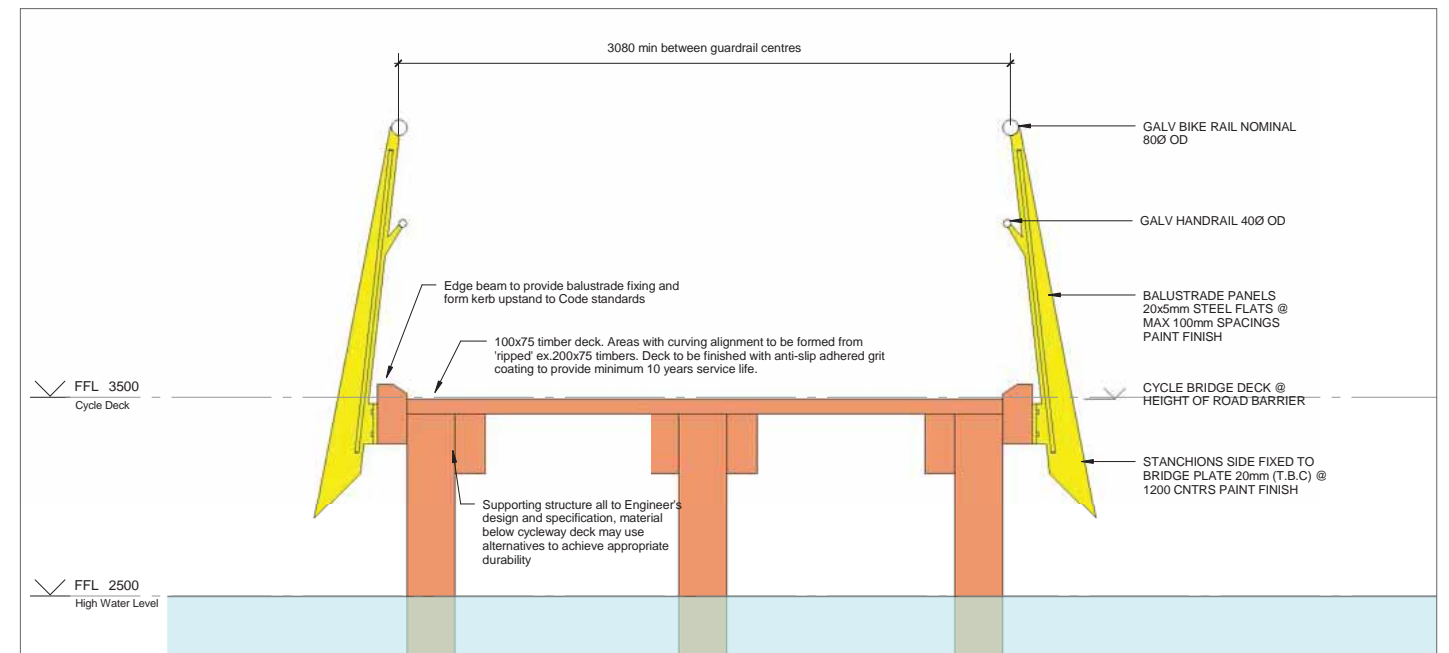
Detail for future cycleway boardwalk under Rosebank off-ramp
